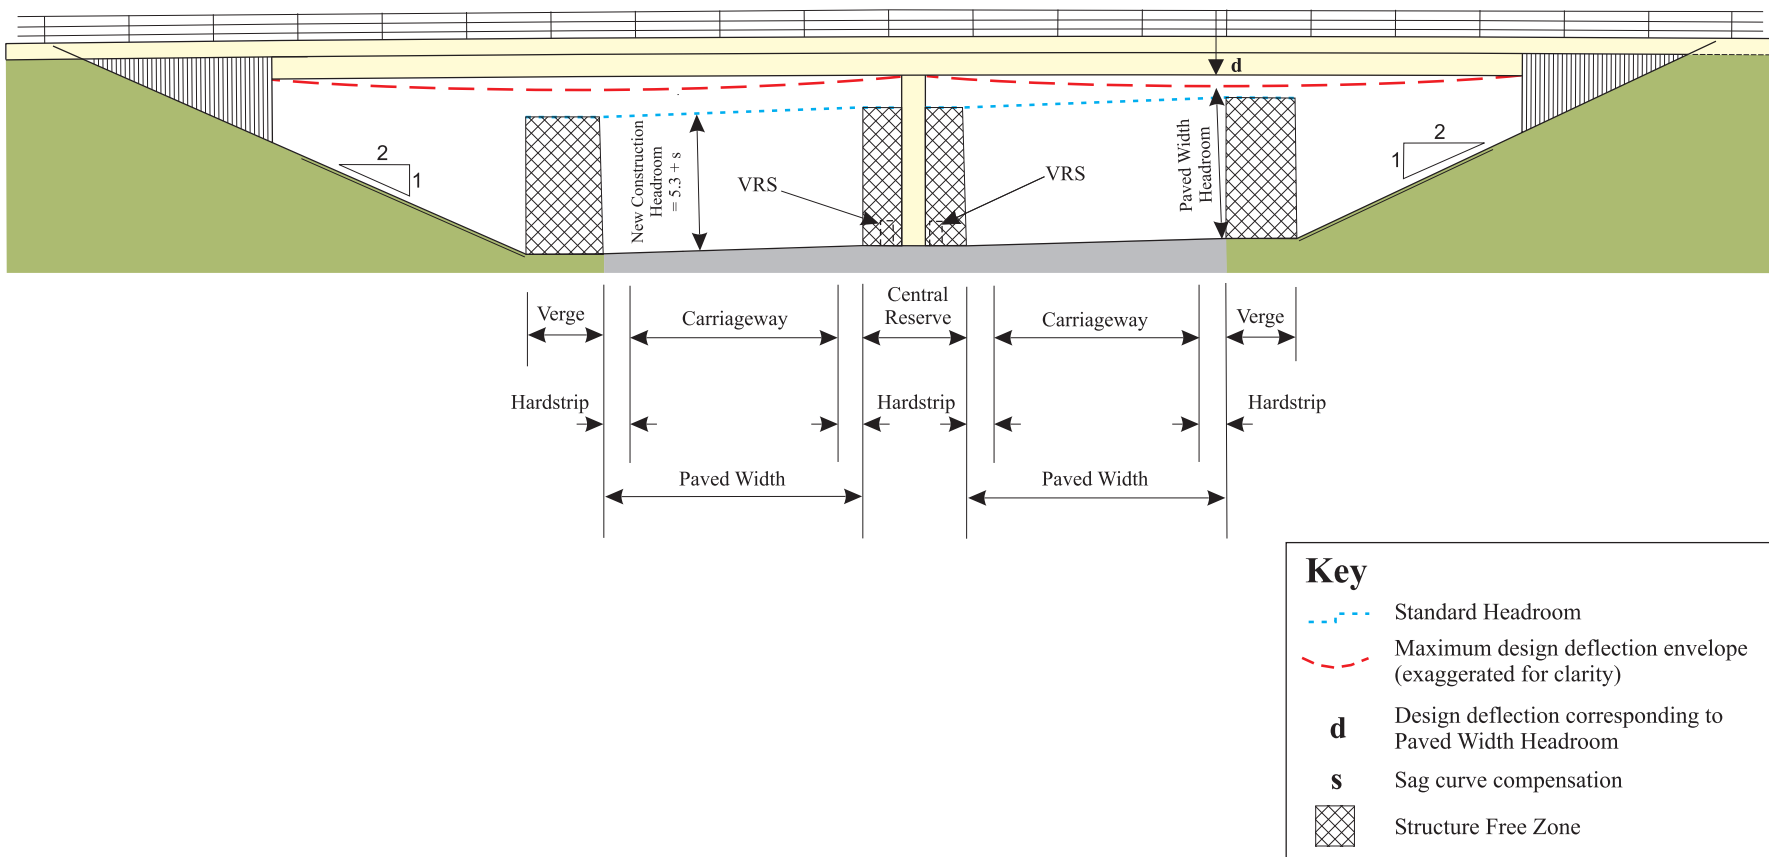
Headroom and Structure Free Zone for a Two Span Structure Crossing a Dual Carriageway
